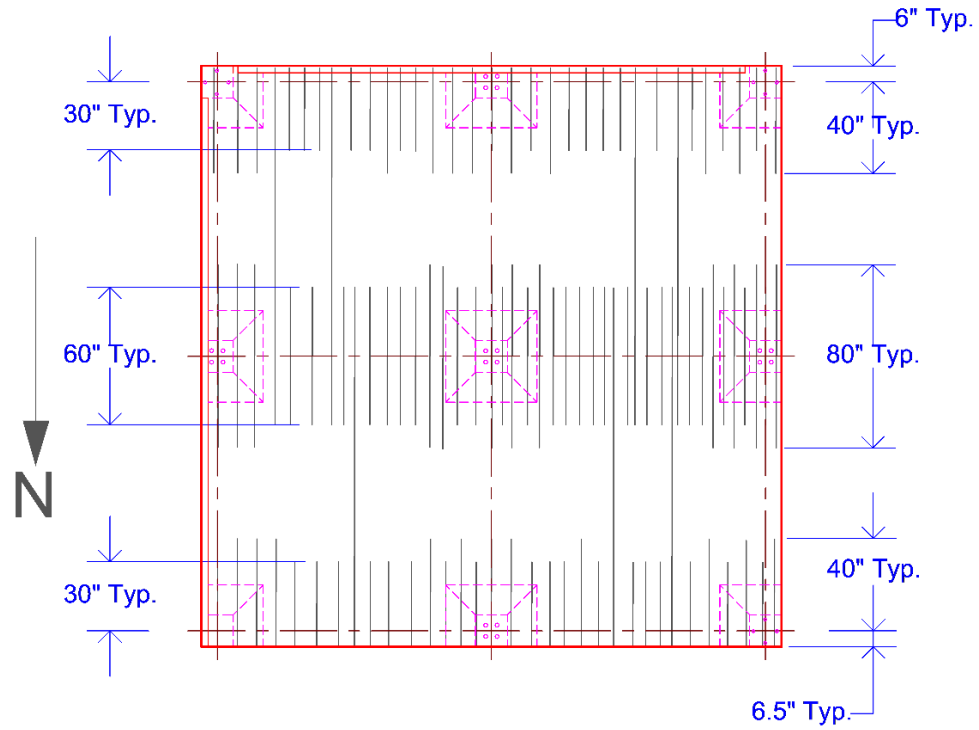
Top slab reinforcement in N-S direction using Grade 40 - #3 bars.
